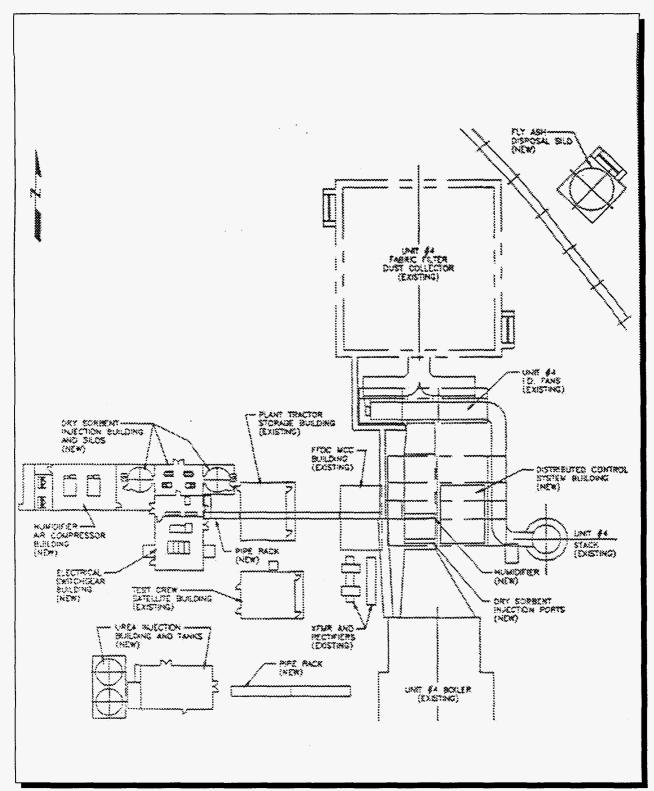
Plot Plan and Layout of Arapahoe Unit 4
